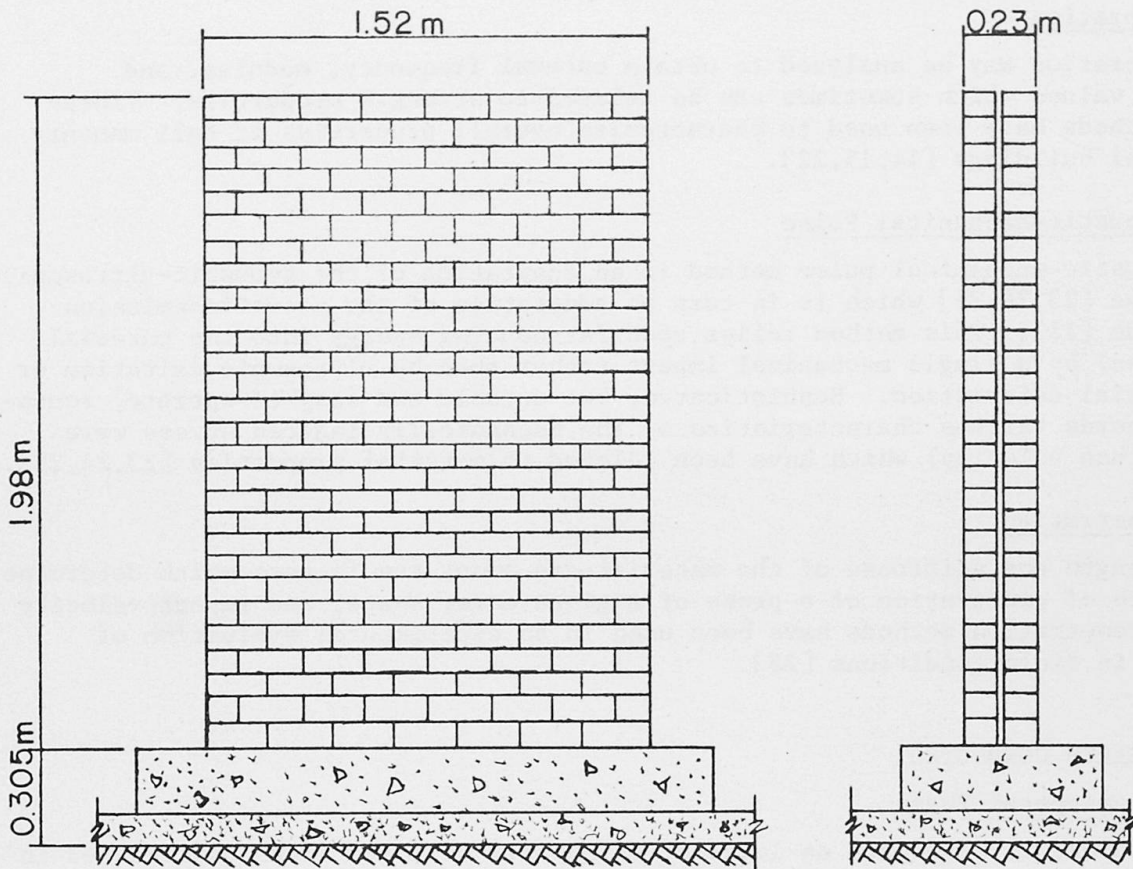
BRICK MASONRY WALL SPECIMEN
